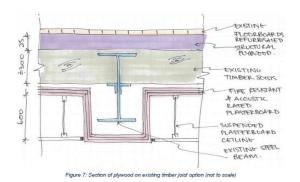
Plywood on existing timber joists—structural detail option 2. (Source: Floor Options Study, Taylor Thomson Whitting Pty Ltd, 2018)
